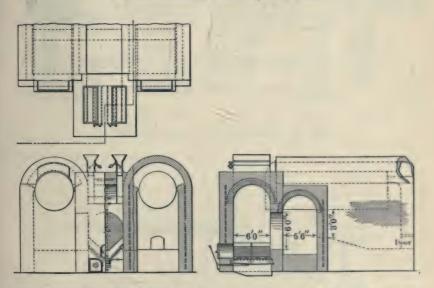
PARTIAL PLAN, SIDE AND END ELEVATIONS OF THE MYERS FURNACE FOR BURNING BAGASSE.
